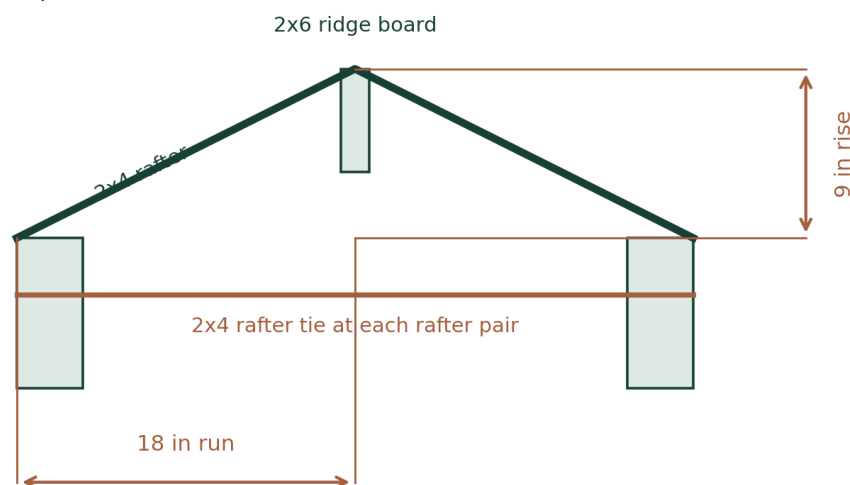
Each rafter pair needs a low tie. The ties stop the walls spreading.
